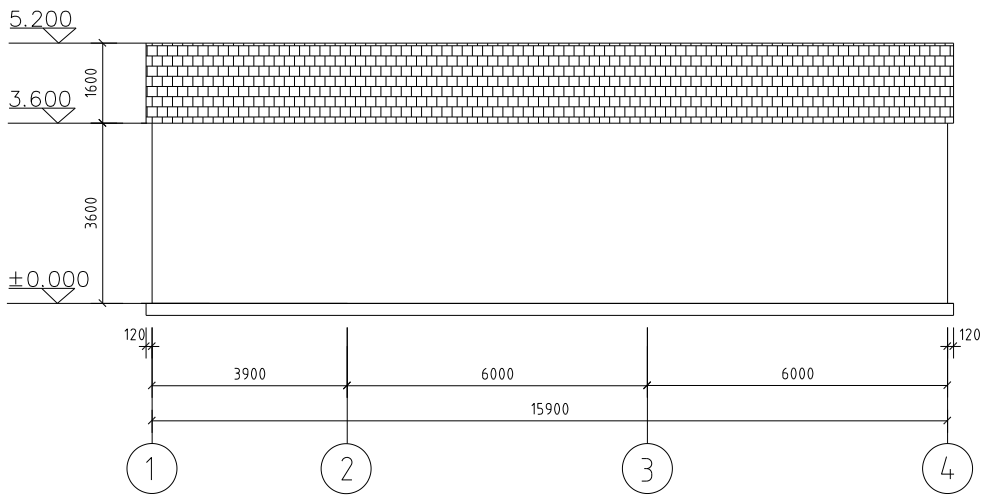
View of typical unreinforced masonry structure in the rural area of China
